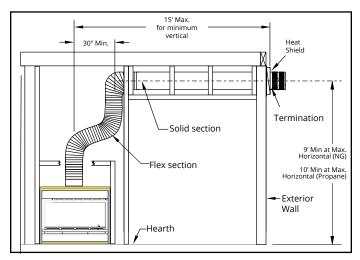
d Top Vented, wall mounted Multi-elbow installation. The vent run must comply with Venting Graph for Top vent, wall mounted terminations, Figure 10 or 10.b
